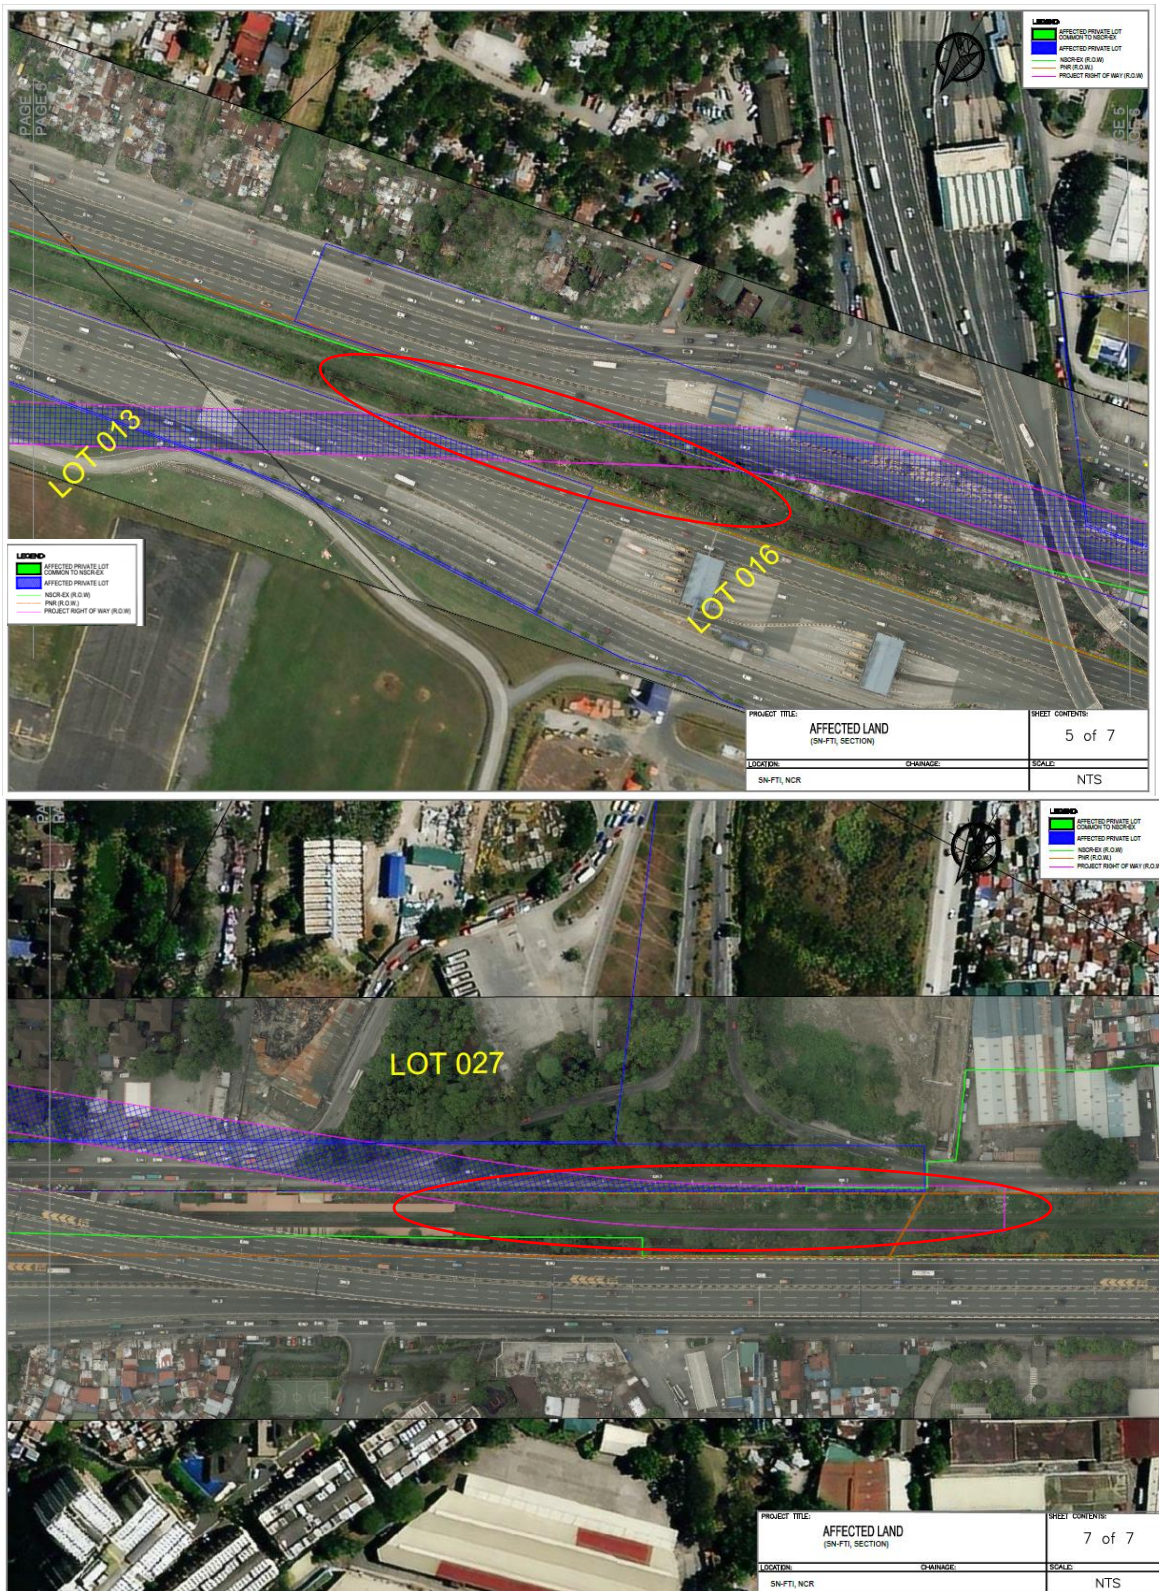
Lots of the Overlap Section of Makati-Buli mainline and Tunnel Section
